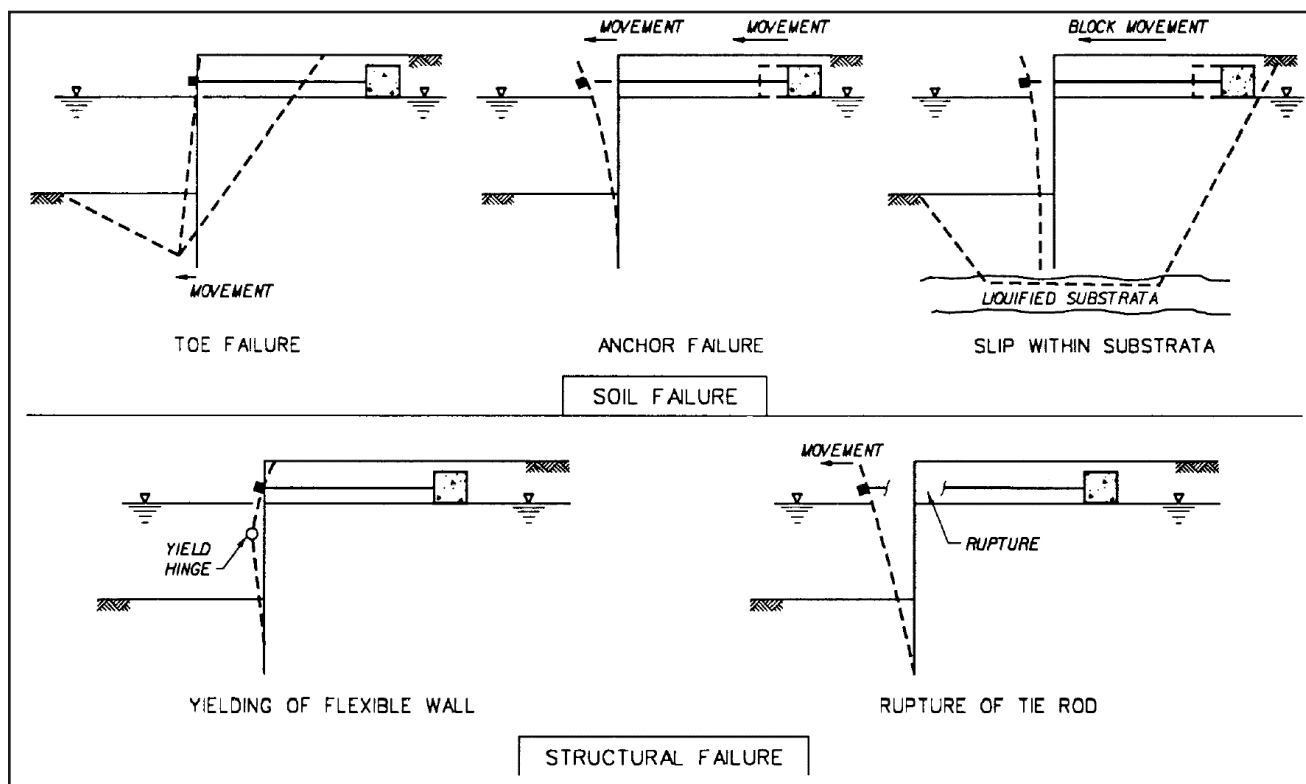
Potential Failure Modes for Anchored Sheet Pile Walls due to Earthquake Activity
